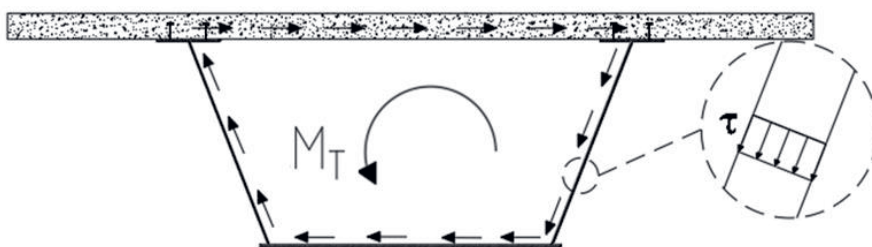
Shear flow for a closed cross-section in a steel-concrete composite box-girder.
